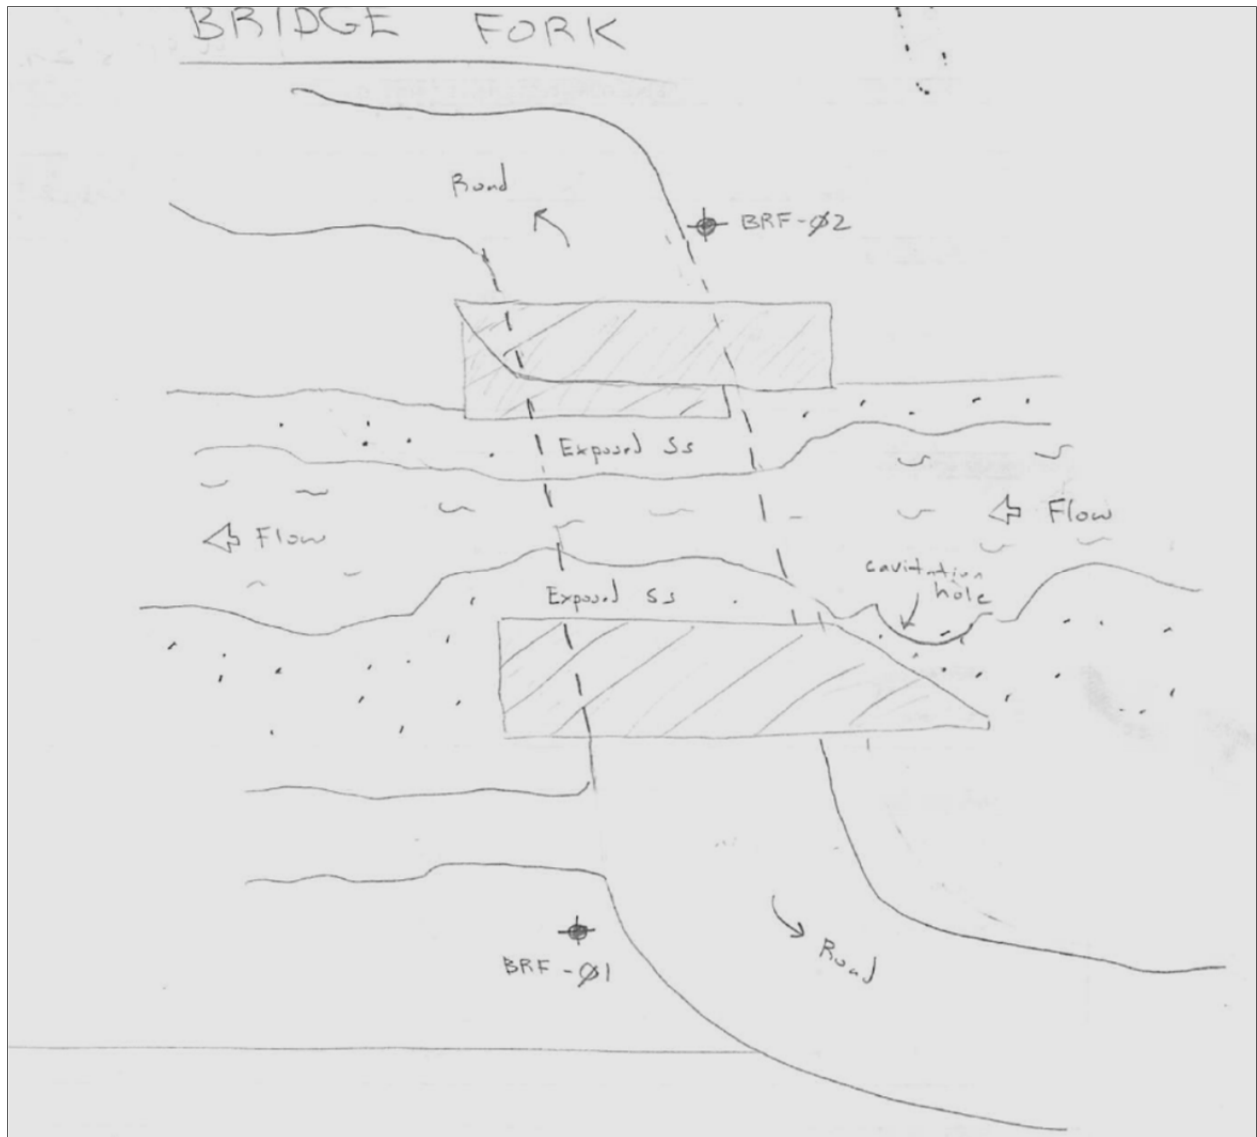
Field sketch of Bridge Fork Bridge, overhead view.
